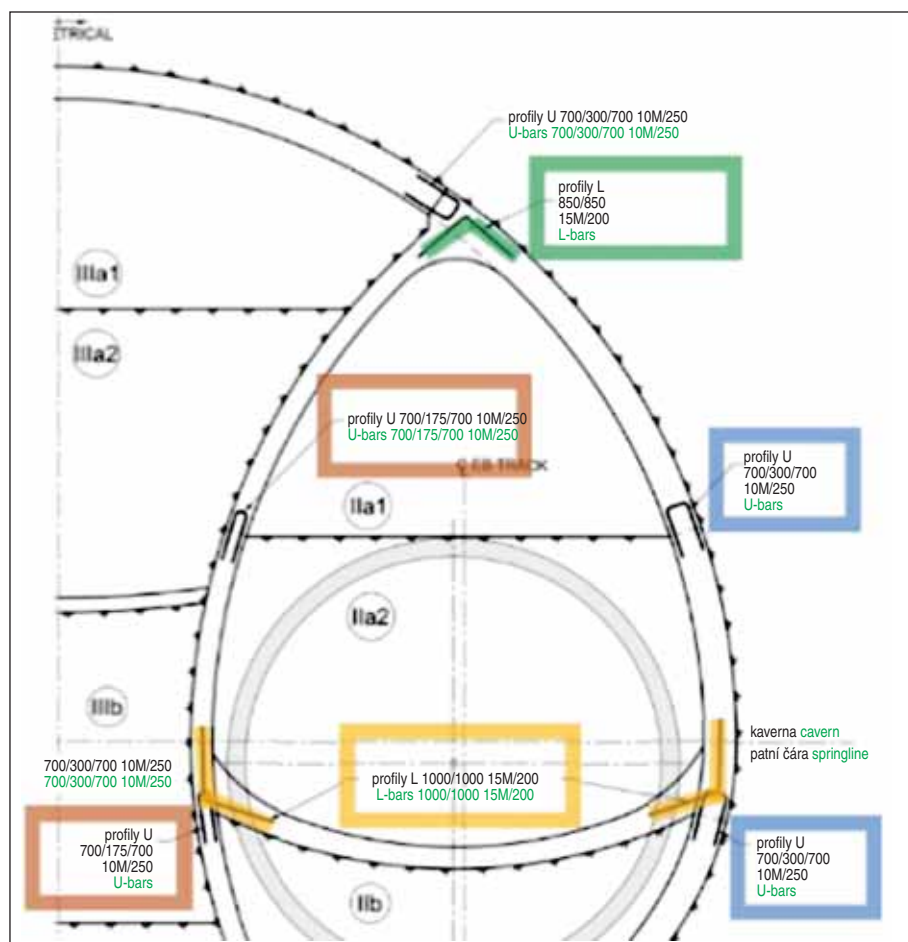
shows the cross-section of the future cavern for the platform area in Avenue station, with the profile designed for a common mined cavern. It is obvious from the picture how the excavation of the side drifts, divided into the top heading, bench and invert sequences, progressed. The thickness of 350mm of the primary lining on the side of the temporary structures, which were removed after the completion of the excavation of the central part of the tunnel, was designed, and the thickness of 450mm was designed by the designer for the primary lining around the circumference of the complete excavation of the station [2].
